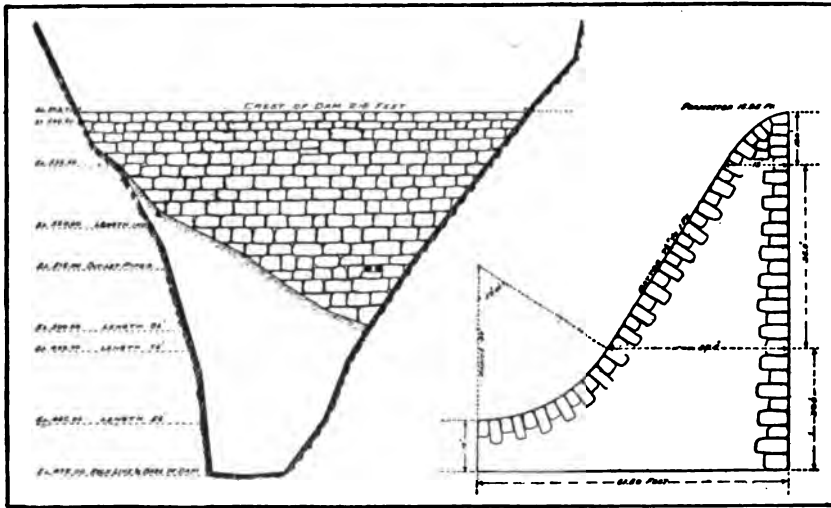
SECTION AND PROFILE OF WALNUT CANYON DAM, ARIZONA.
